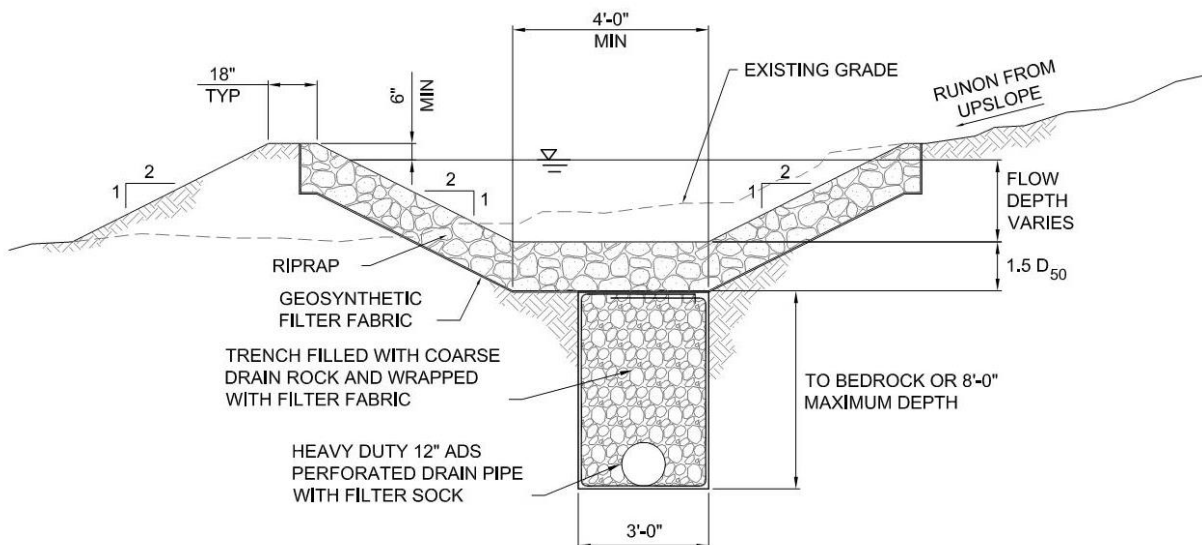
Cross-section for Typical Riprap-lined Run-on Diversion Ditch
